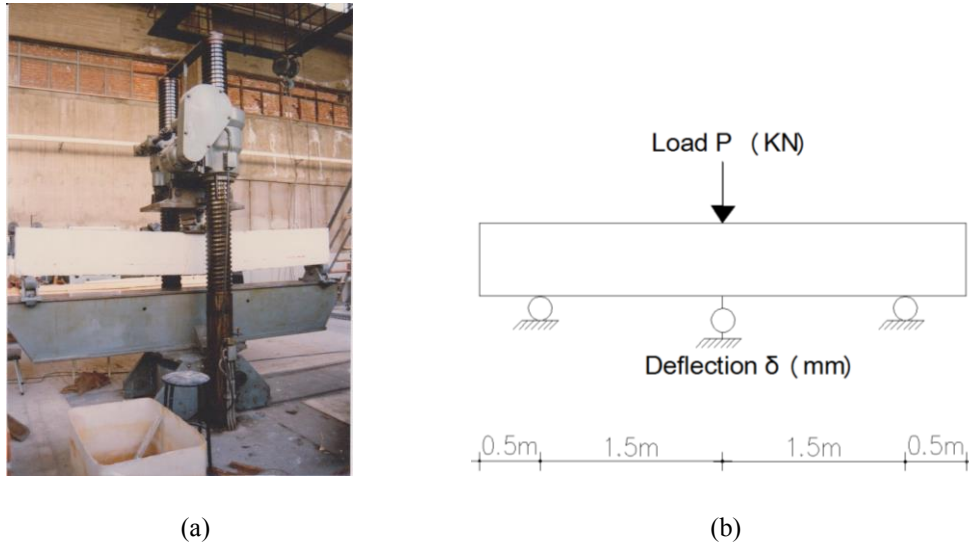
(a) Loading setup of specimens of the first group. (b) Loading setup of specimens of the second group.
